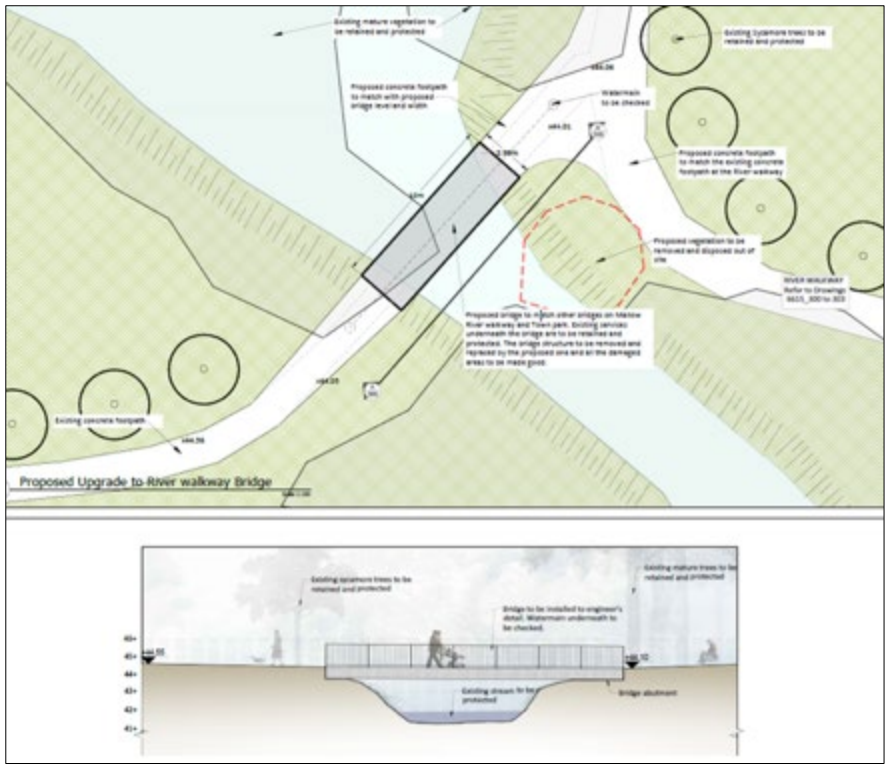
Extract from Architects Proposed Bridge Widening Drawing | Source Brady Shipman Martin
